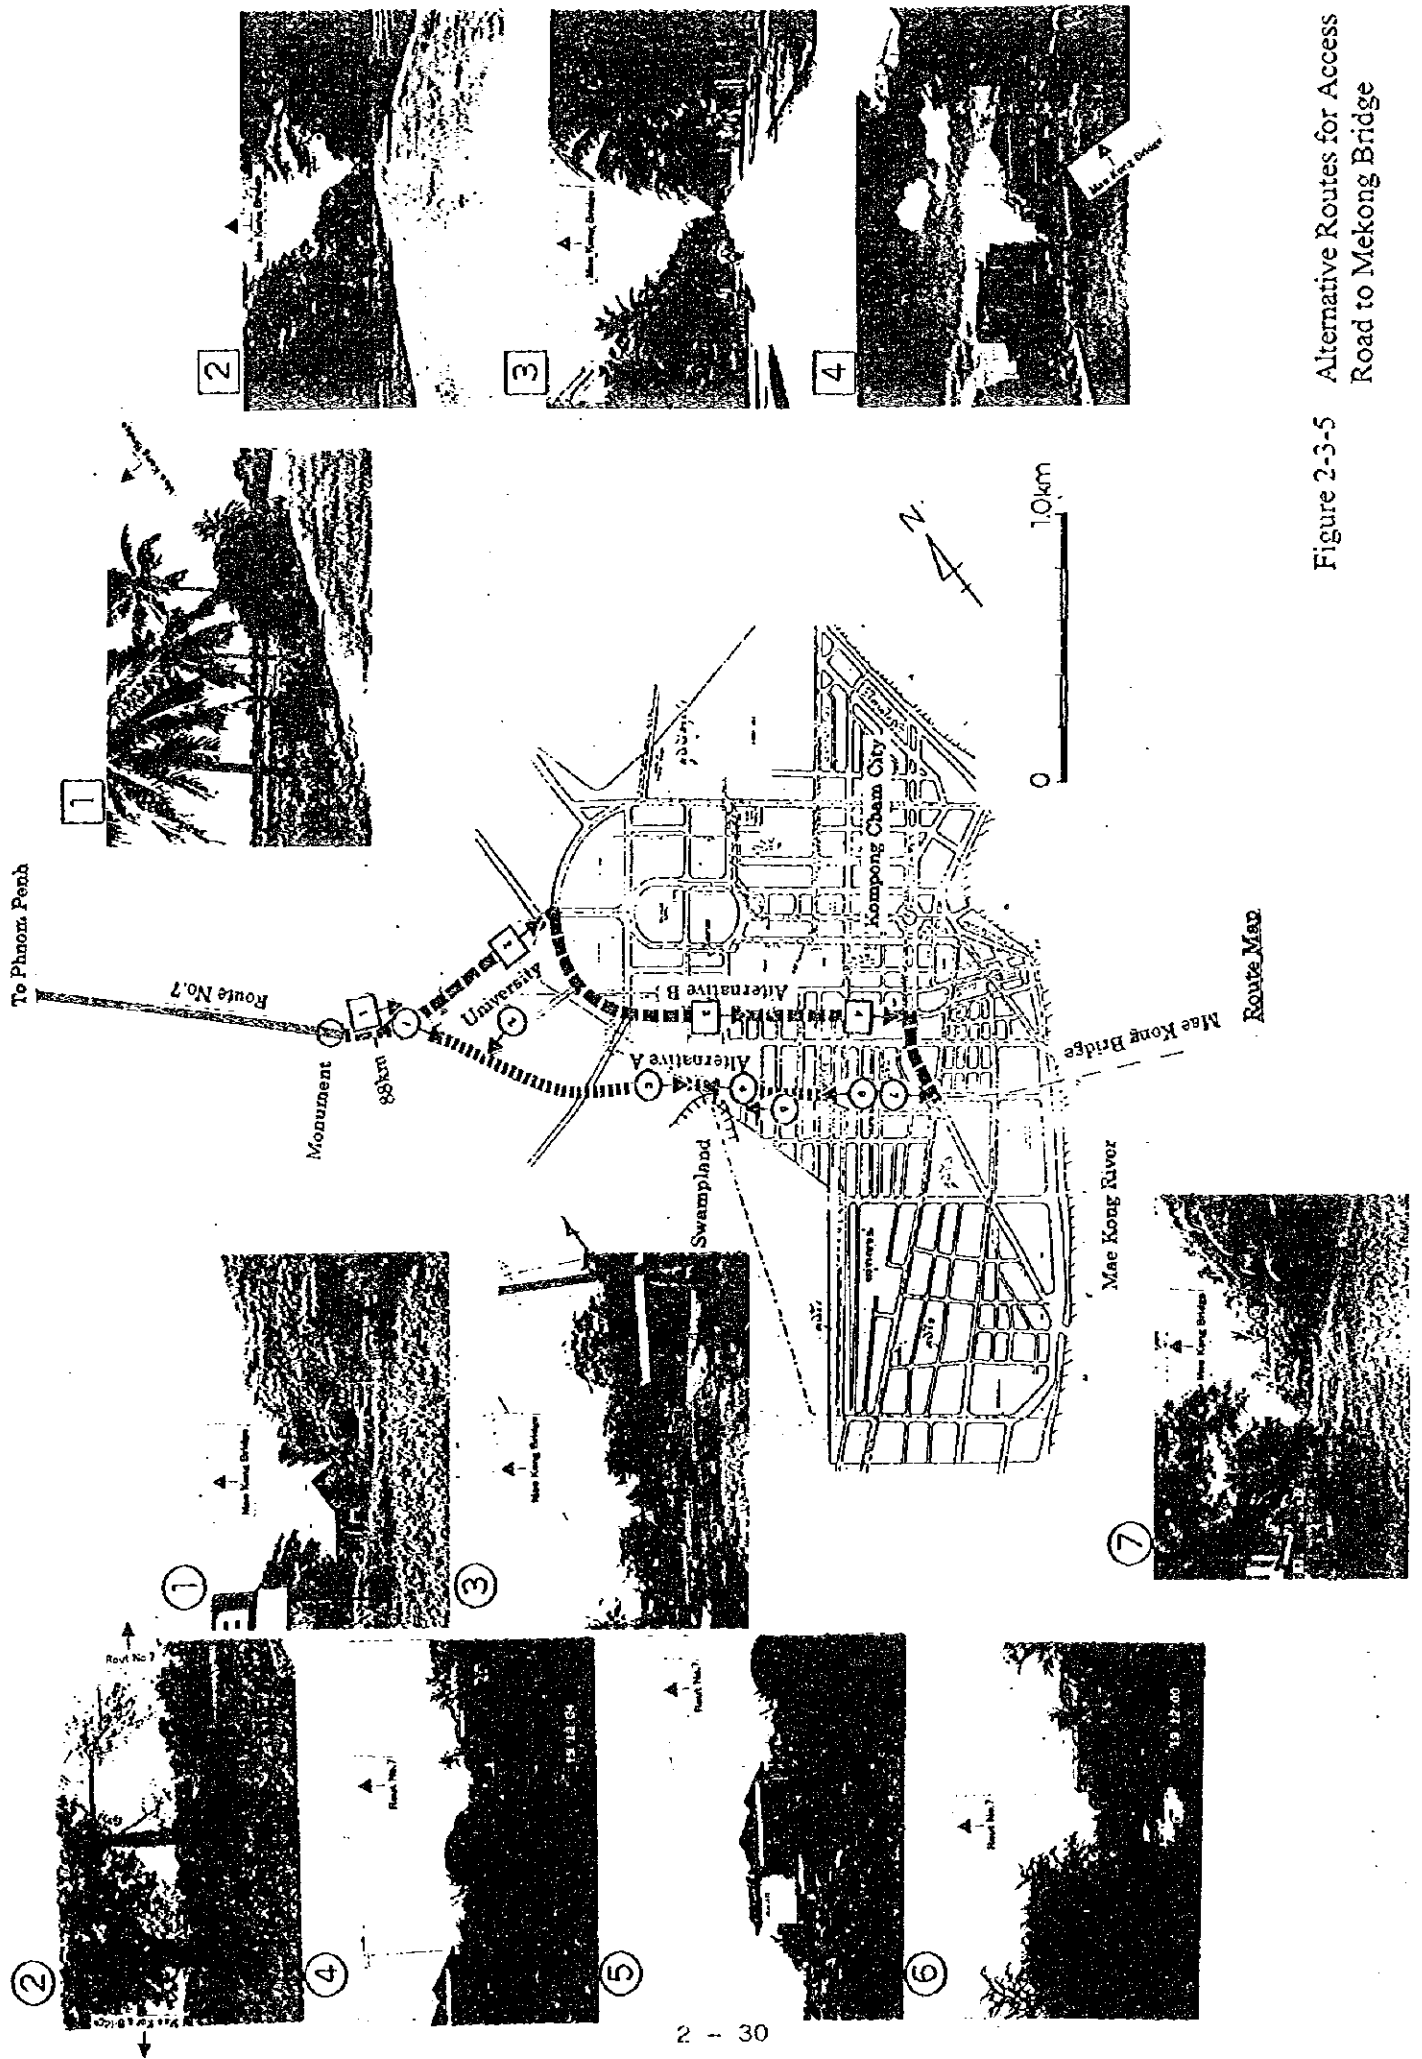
Alternative Routes for Access Road to Mekong Bridge
